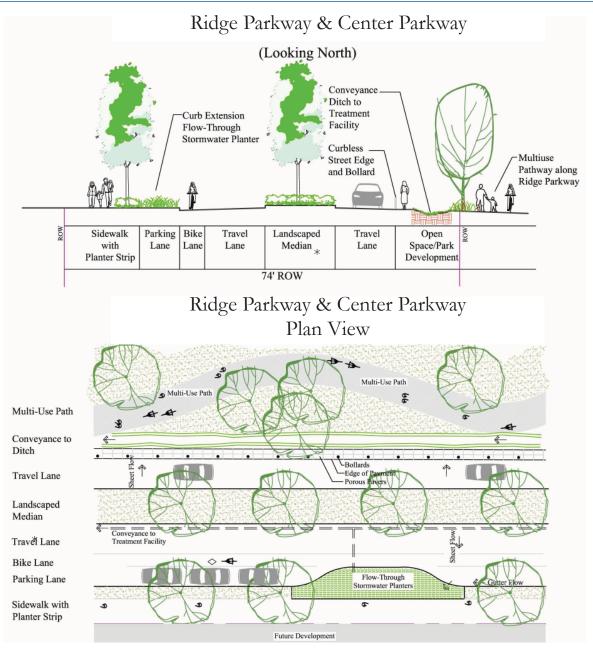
Ridge Parkway and Central Parkway Green Streets
